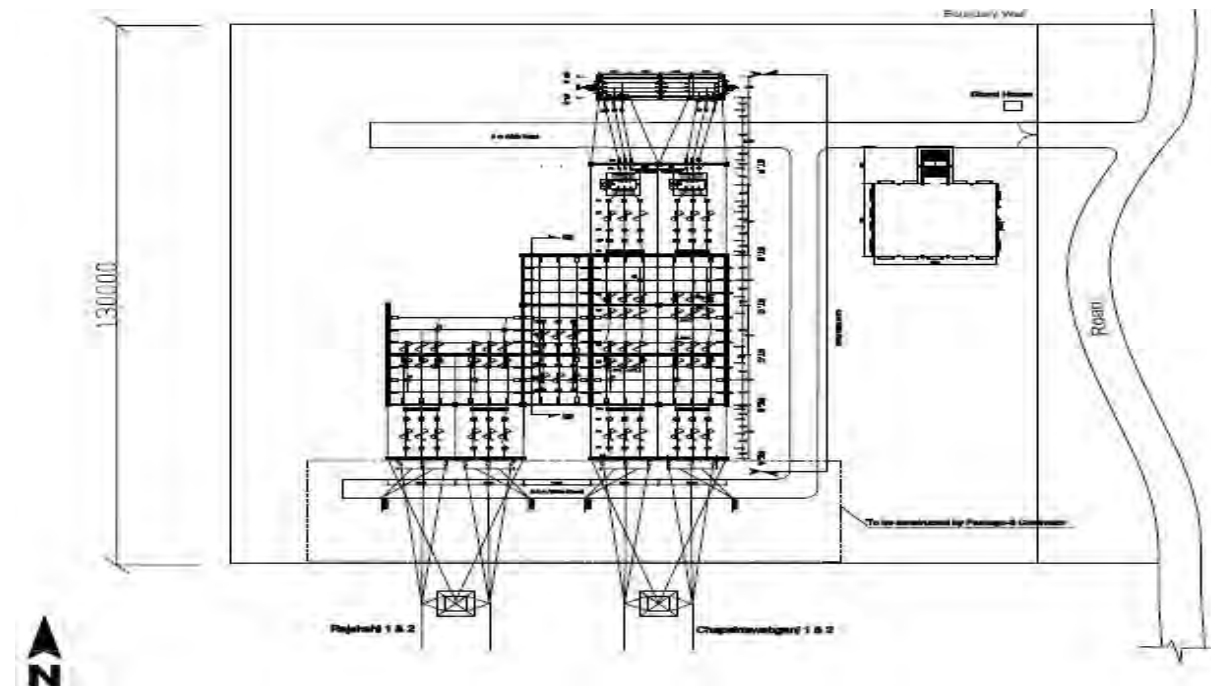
This is a typical electrical layout of 132/33kV substation at Rajshahi.
